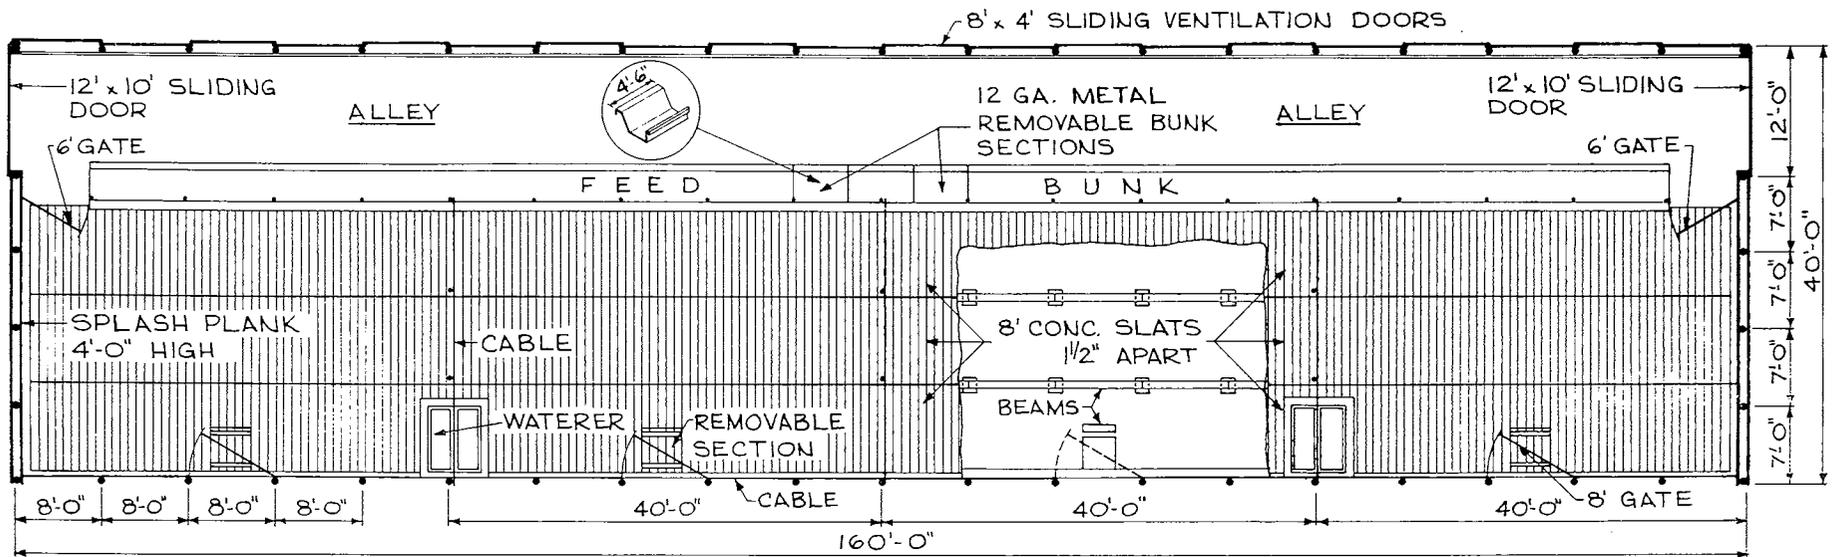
Plan view of floor above pit of a cold slatted floor building.
